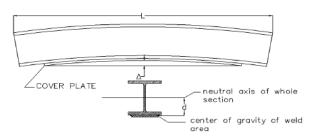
The welds connecting the cover plates to the beam flange.
